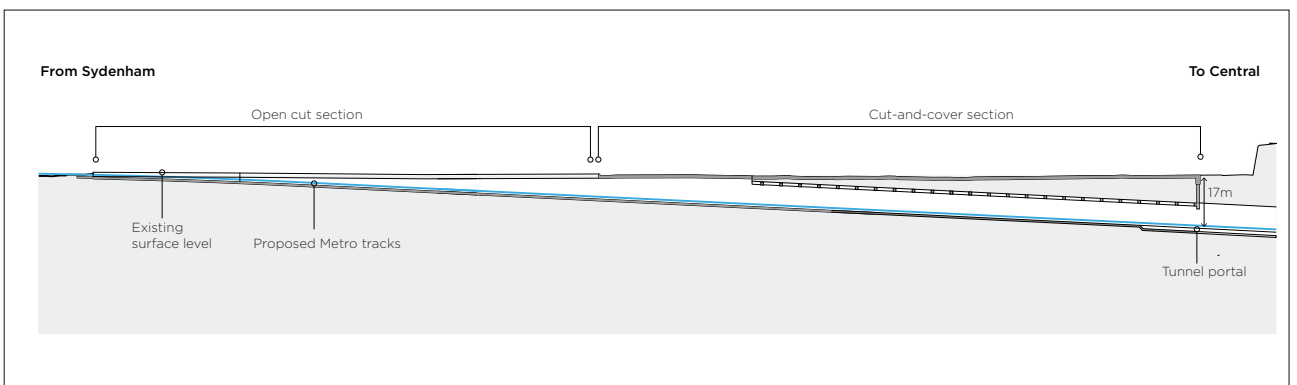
Marrickville dive structure and tunnel portal – indicative long section
